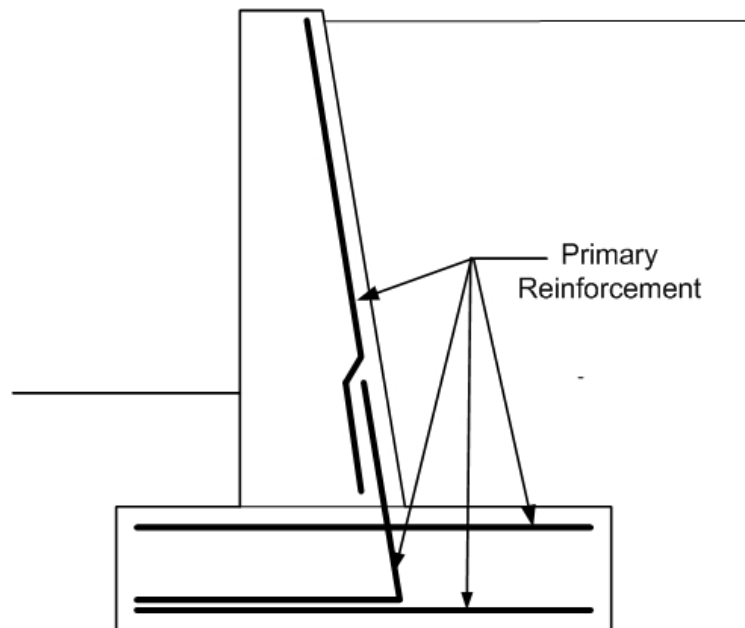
Primary Reinforcement in Concrete Cantilever Wingwall
